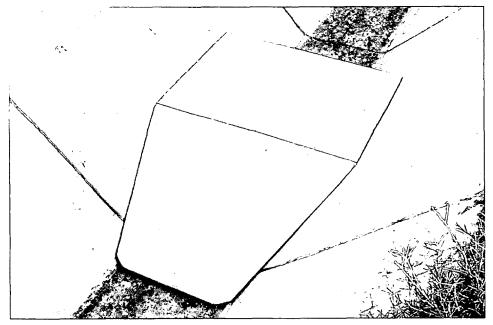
A temporary broad-crested weir constructed from commercial-grade plywood.
